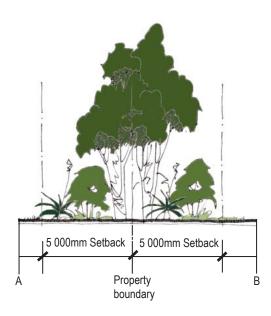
SECTION 16: Typical 10 metre landscape front setback
